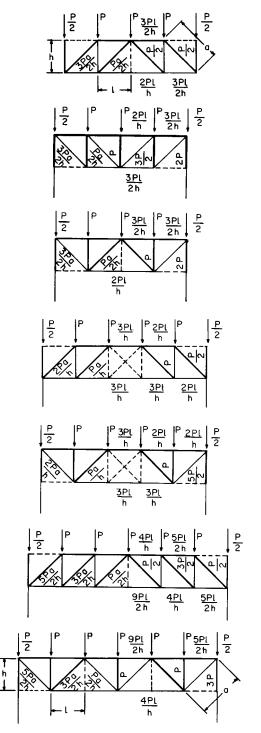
to 12.2.13 Types of floor and roof trusses.
